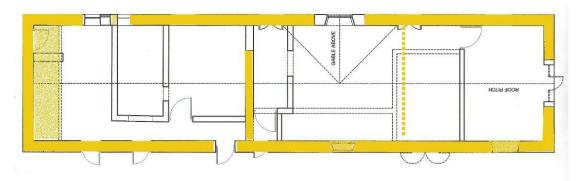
Projected layout of the structure. The two doors in the eastern section of the structure imply a second dividing wall which may have coincided with the demolished wall.
